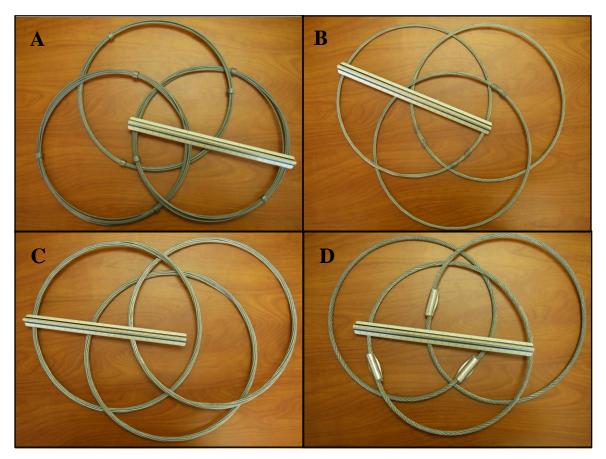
Photographs of (A) Geobrugg, (B) IGOR, (C) Maccaferri, and (D) ROTEC rings with 12 inch engineer scale for reference.
